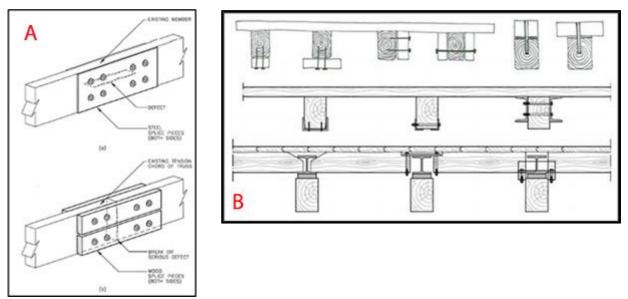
(A) Reinforcing damaged members by adding side pieces: (a) using a steel splice plate to reinforce a beam with a serious defect; (b) using wood side pieces to repair the broken bottom chord of a truss [22]. (B) Examples of reinforcement techniques of timber floor beams [30].
